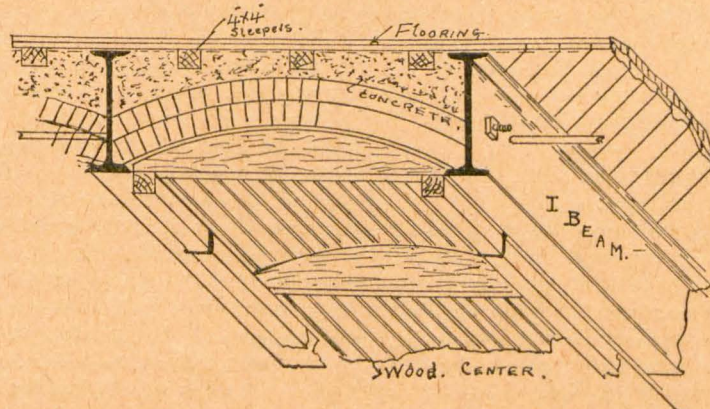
SECTION OF FIREPROOF FLOOR AND ITS CONSTRUCTION.
